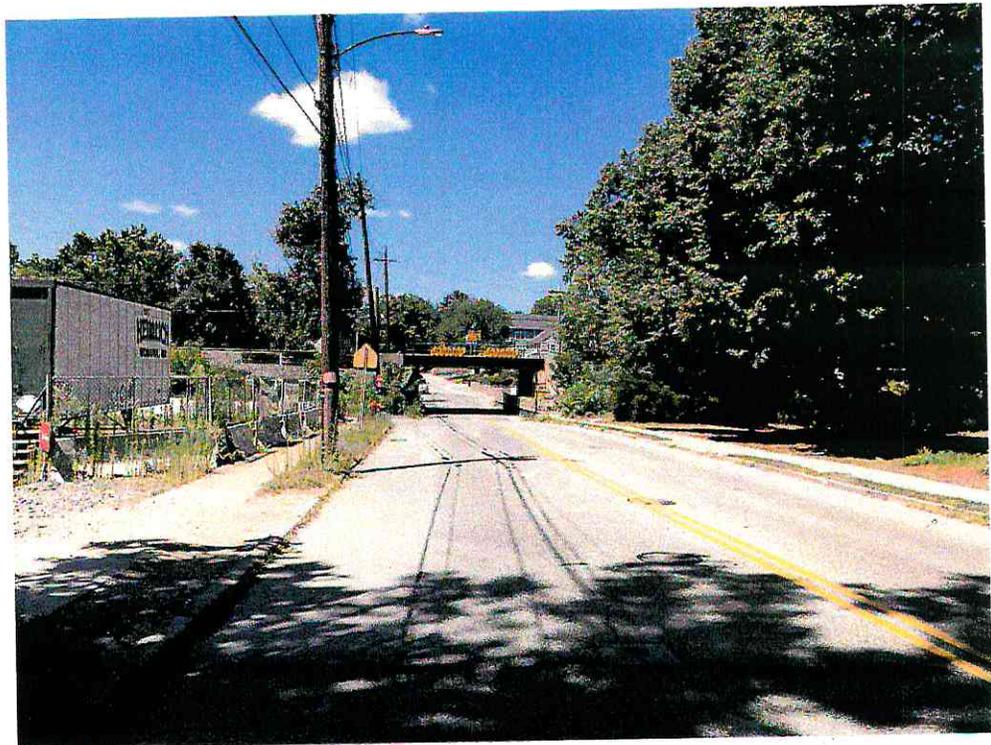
Location Q – Cross St. looking west. 115' east of MBTA Bridge.
